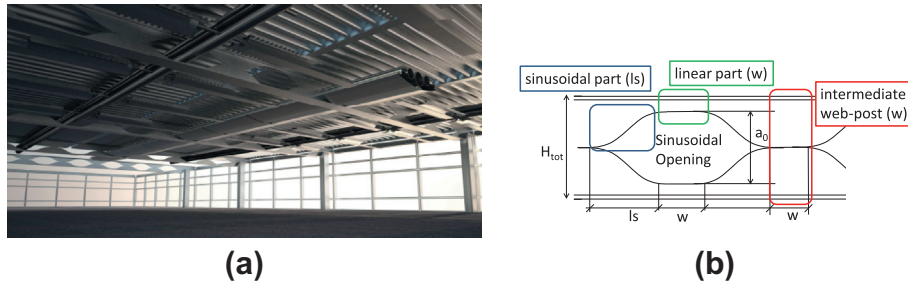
Example of a floor with Angelina™ beams (a), sinusoidal opening description (b).
